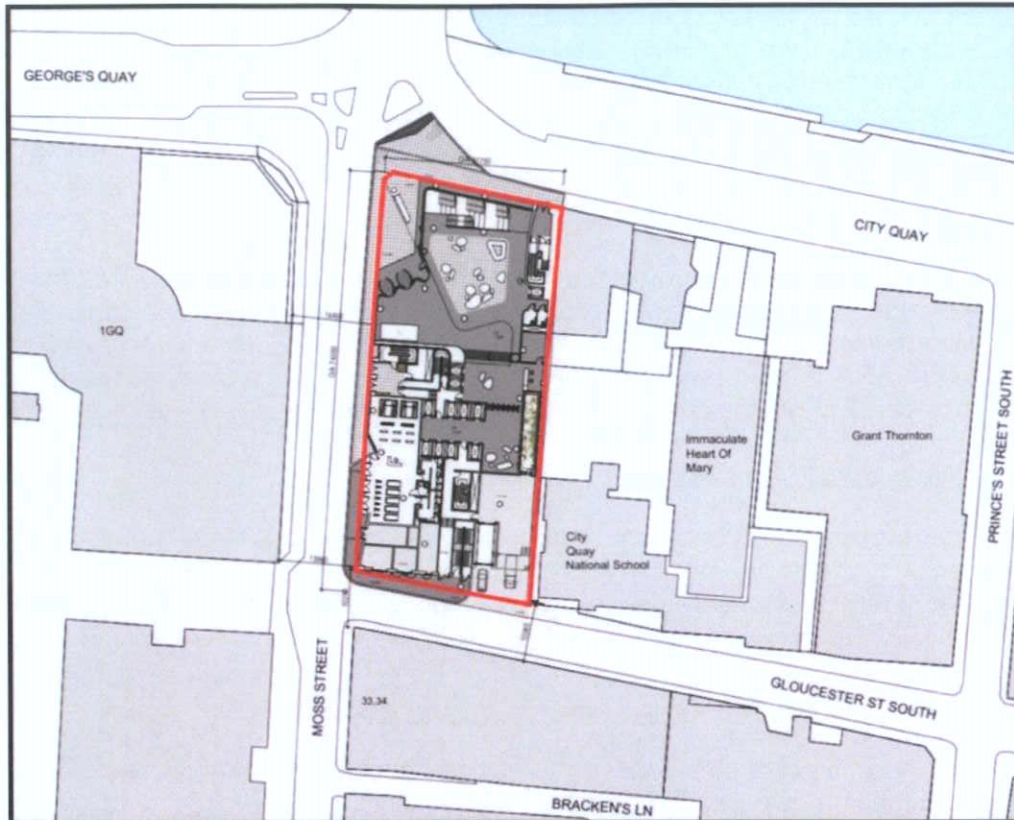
Proposed Site Layout (Mahoney Architecture)
